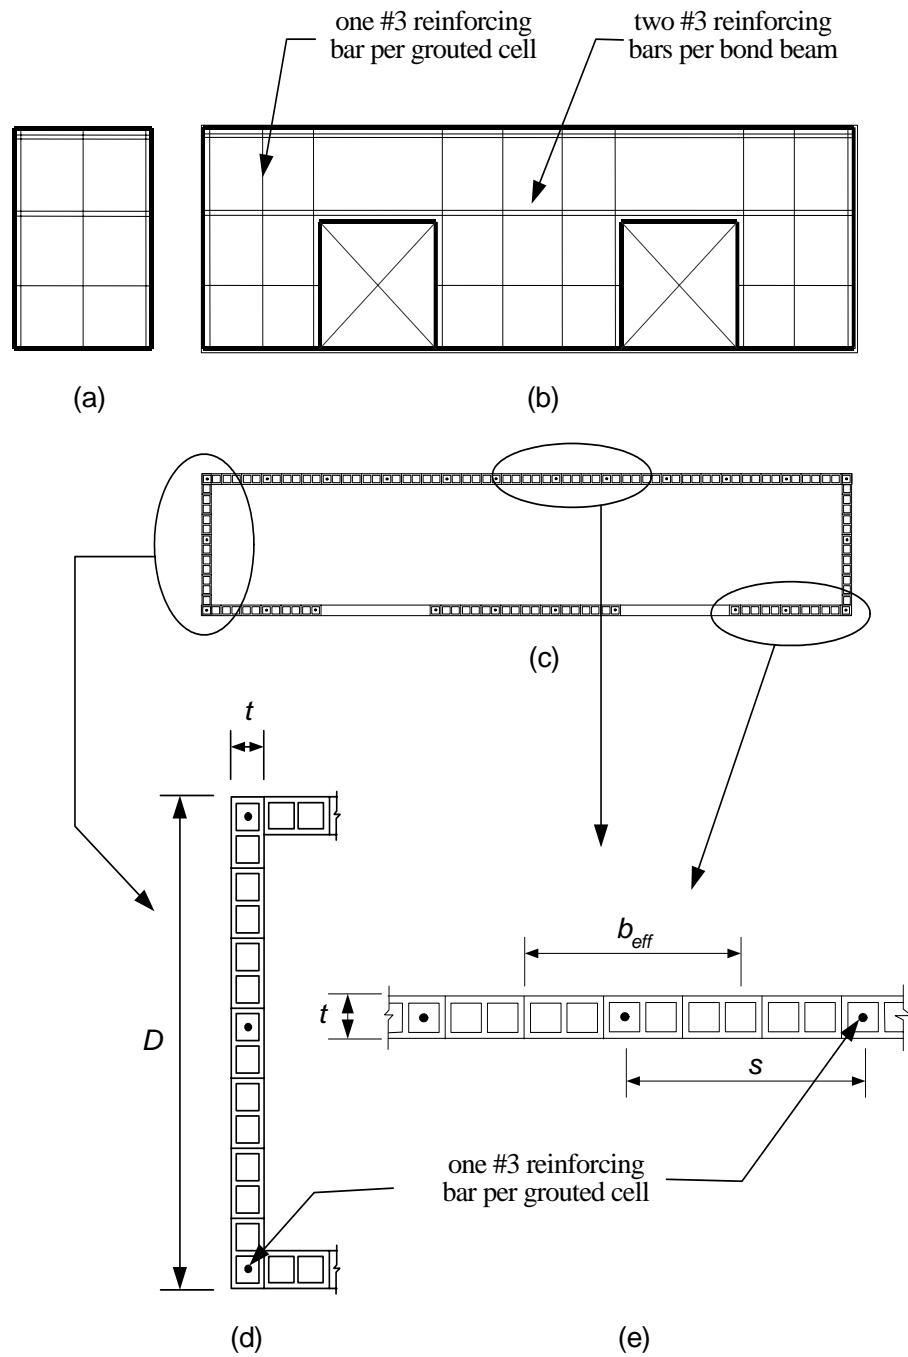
Reinforcement of masonry walls: (a) North and south wall; (b) East wall; (c) Plan; (d) North and south wall detail; and (e) East and west wall detail (Cohen 2001).
